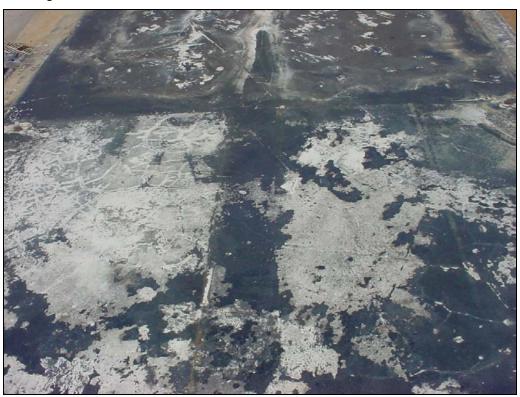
Parcel 4, Water Treatment Plant (Building #16). View east of northern raised footing.
